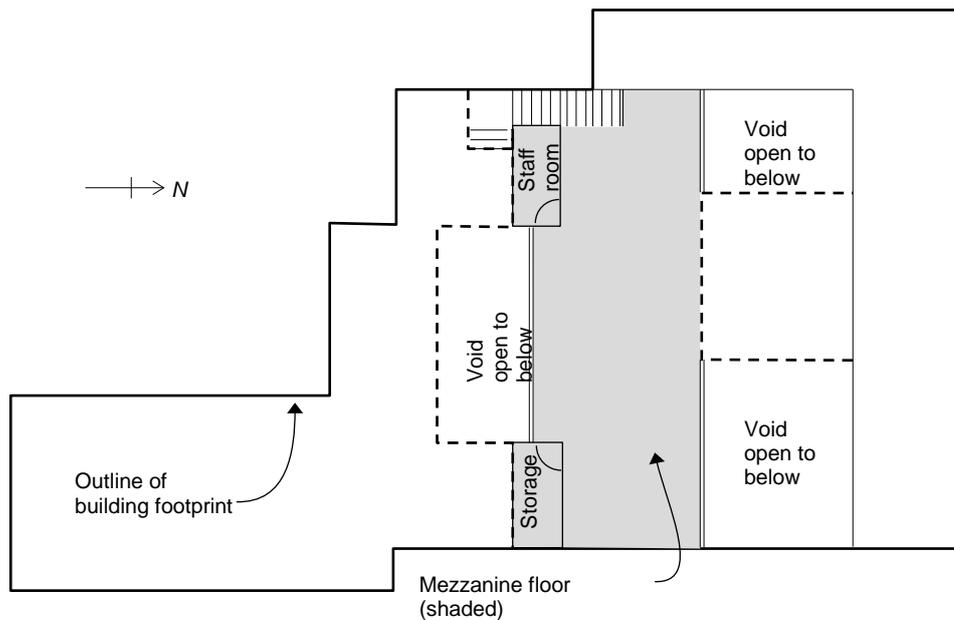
Plan showing mezzanine over ground floor (not to scale)
